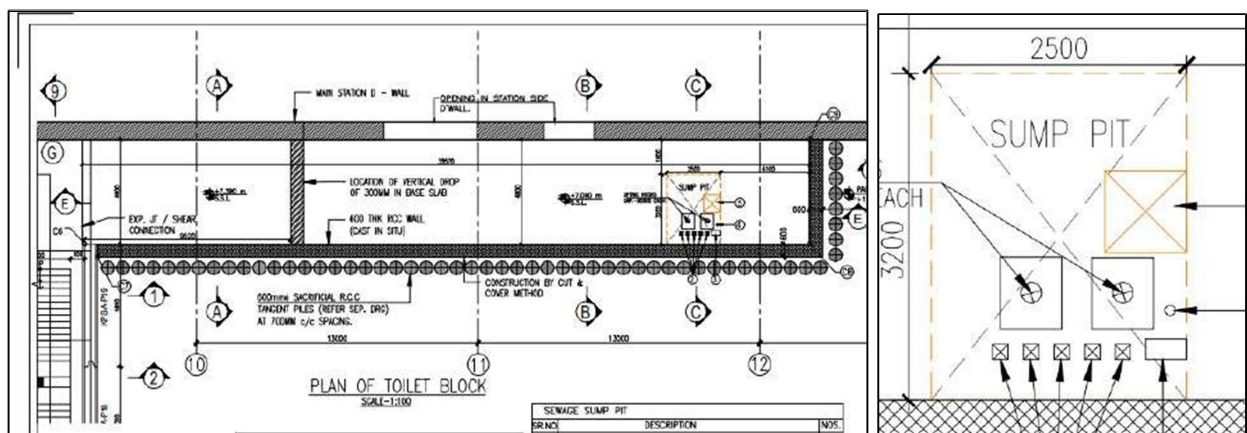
Toilet Block and Sump Pit of Kapodrea Station of Surat Metro
